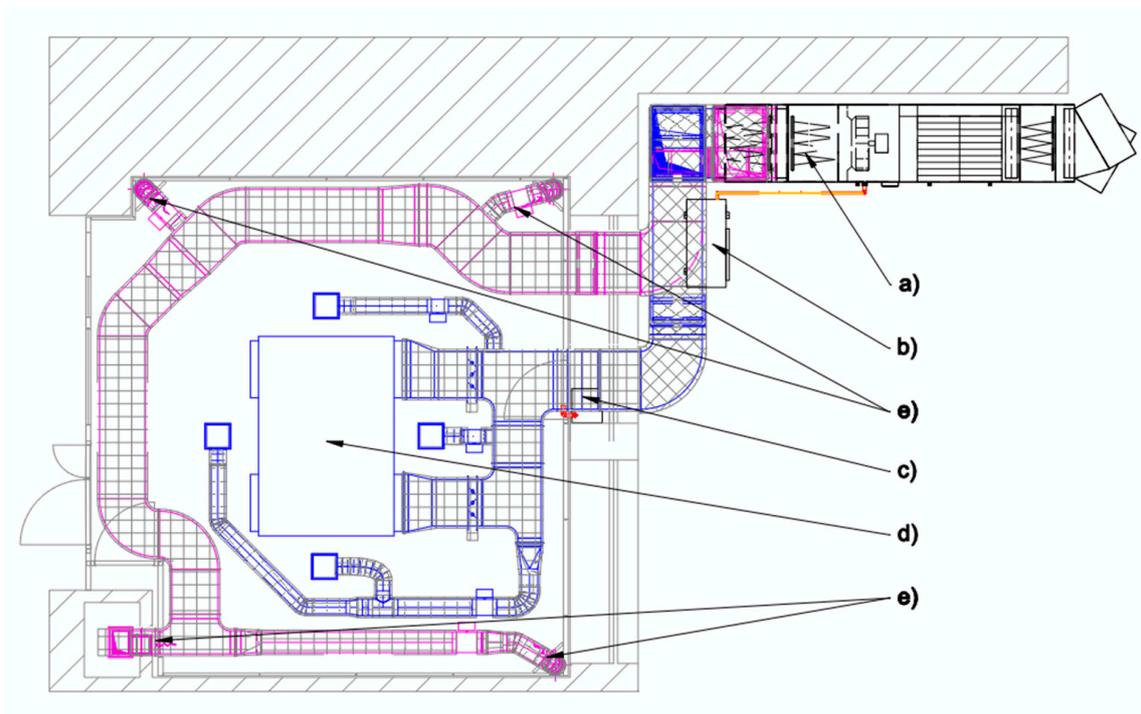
HVAC floor plan drawing: (a) ventilation unit, (b) heat pump, (c) air humidifier, (d) LAFC, and (e) drainage outlets.
